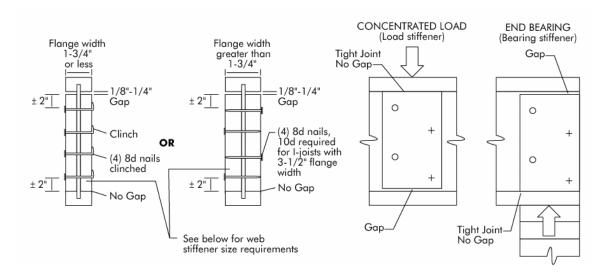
PRI I-JOIST WEB STIFFENER CONSTRUCTION DETAILS
